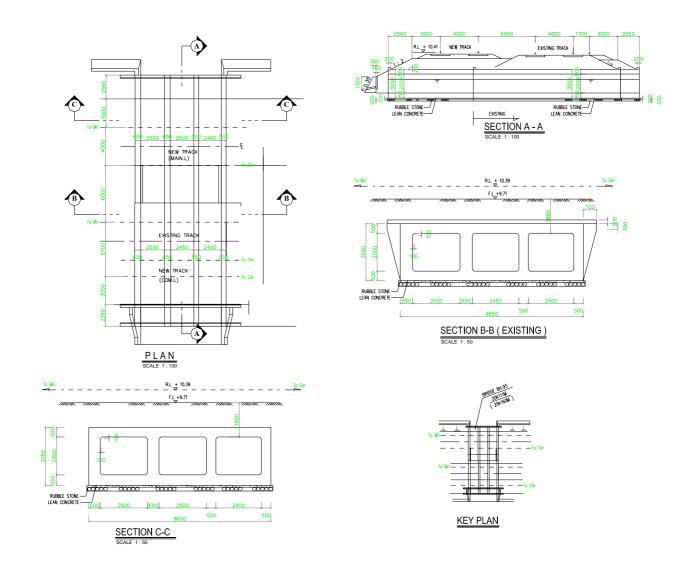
Typical Box Culvert (Example from No.93)
